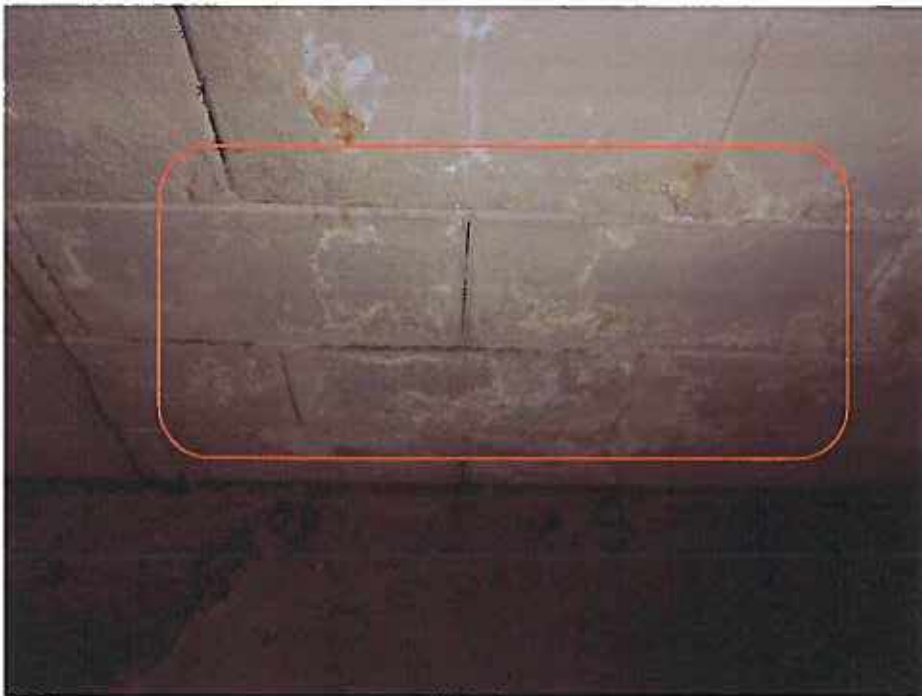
Efflorescence bloom on the CMU foundation wall along El Camino Real.
